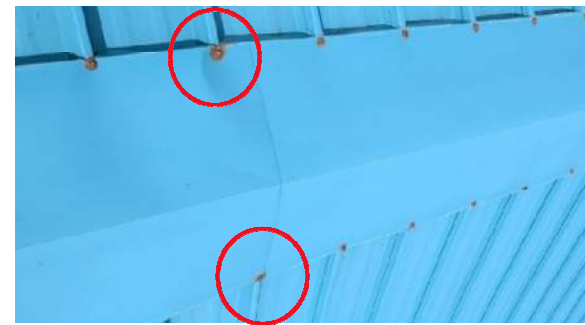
Dented ridge flashing. Rust forming under fastener. All ridge fasteners are rustin.
